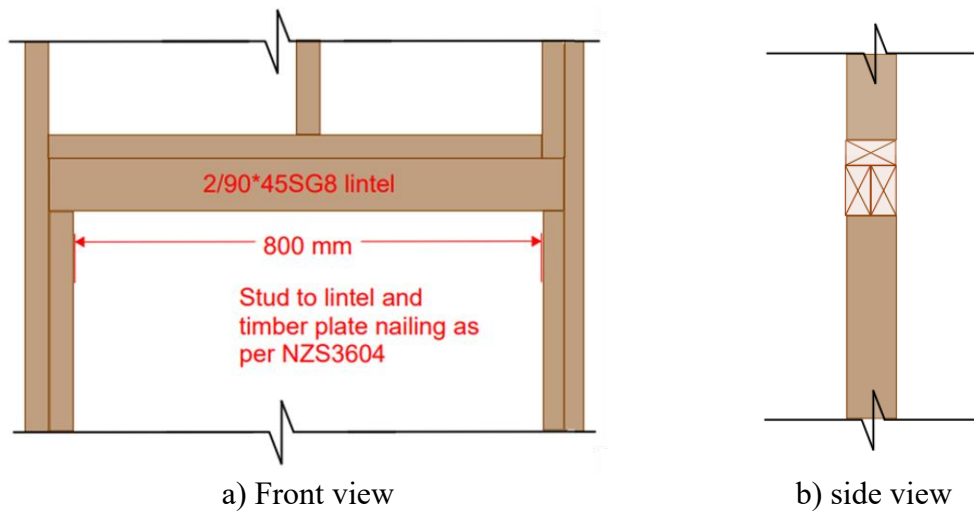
Door lintel elevation detail (similar to Phase II)
